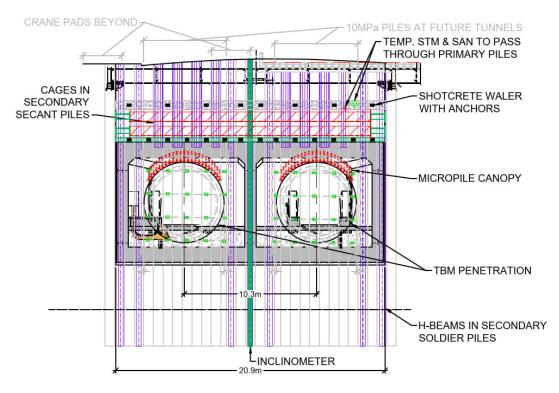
Conceptual shoring solution using walers and struts at Cypress Street opening in Zone 5
